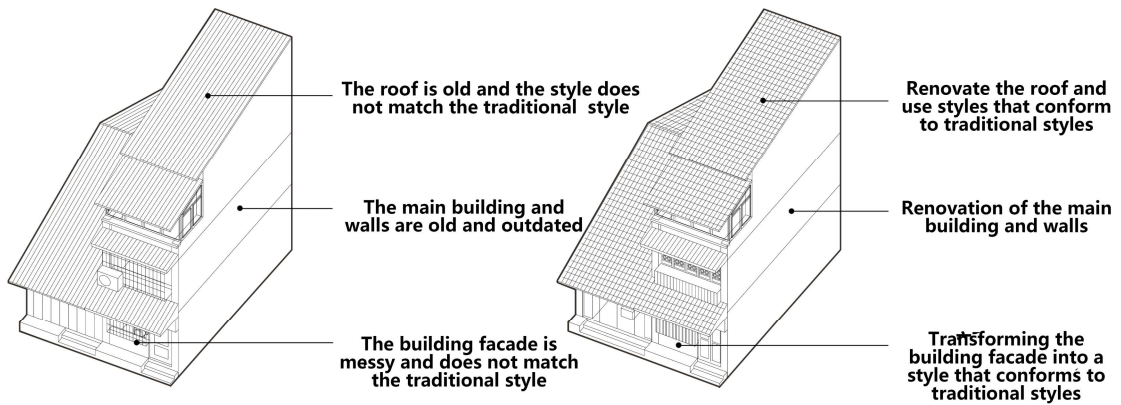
Protection and Renewal of Residential Building No. 113 and 115 Haopan Street
